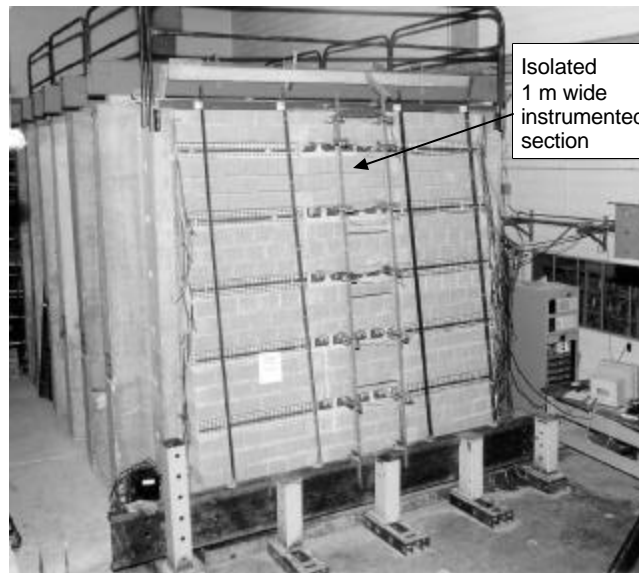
Geosynthetic reinforced segmental retaining wall (Wall 1)
